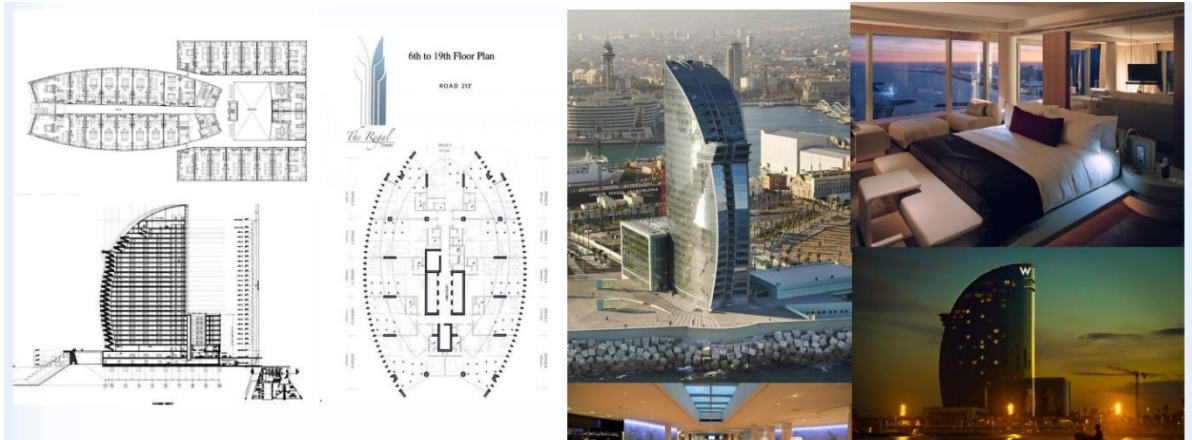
Plan and views of W Barcelona Hotel Spain
